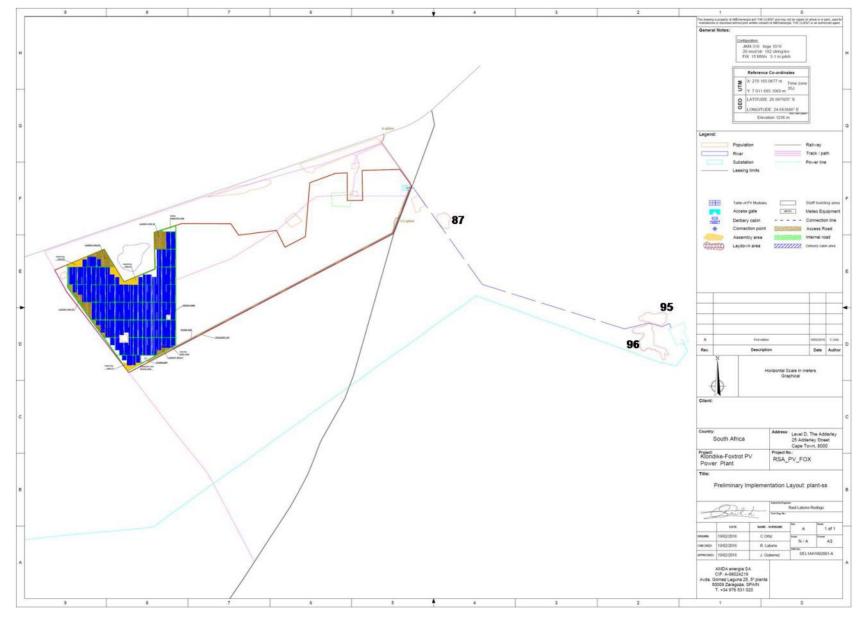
Revised development layout plan for AMDA Foxtrot SEF and Grid Connection (courtesy of the applicant). Note that sites selected for conservation are avoided.
